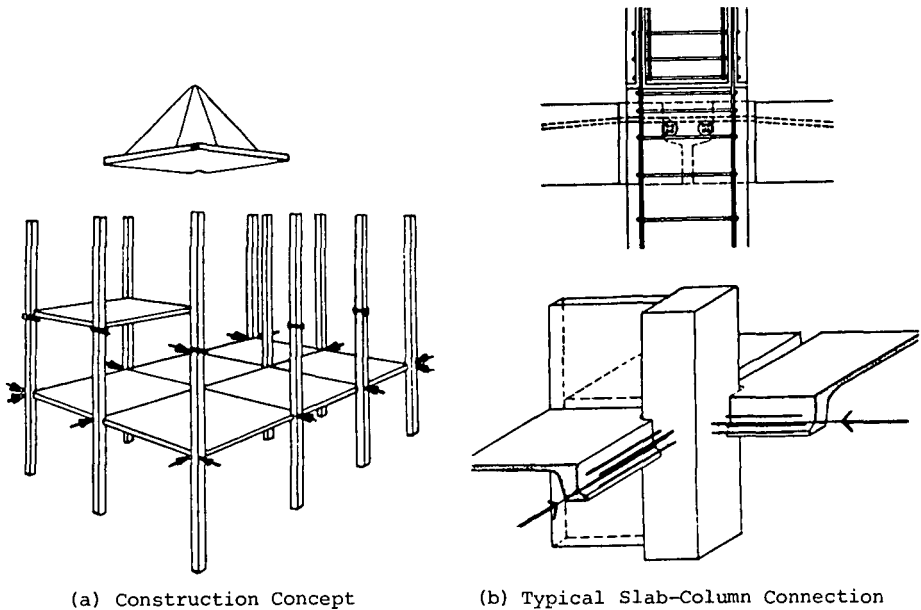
Slab-Column System Incorporating Prestressing to Achieve Continuity.
